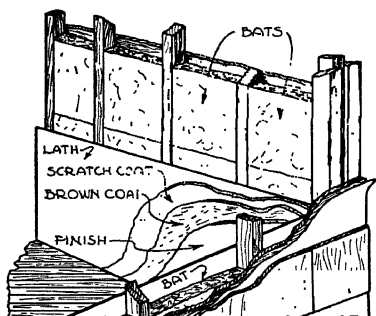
Isometric View of Frame Wall Showing Bat Type of Insulation
